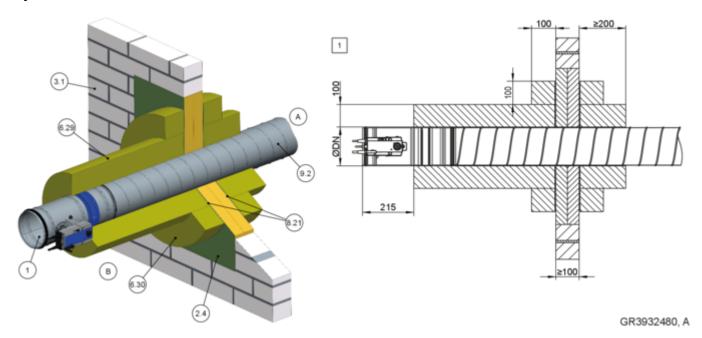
Dry mortarless installation remote from solid walls with mineral wool and fire batt
